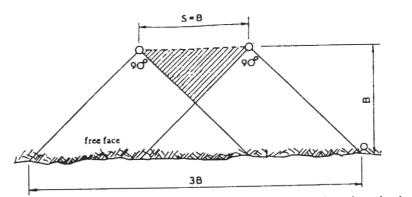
Adjacent charges breaking on separate delays need spacing ~ burden.
